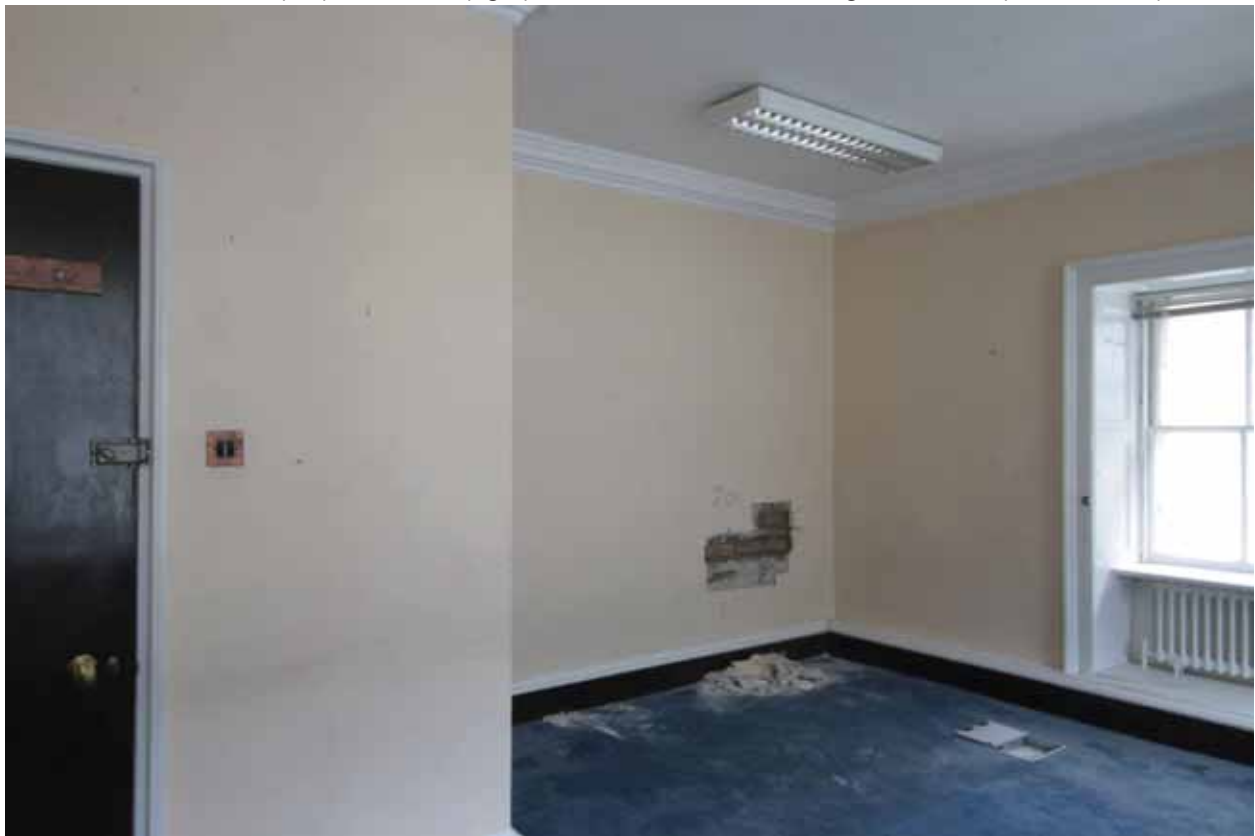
West (left) and north (right) walls in Room S28, looking north-east (EAF10 0112)
